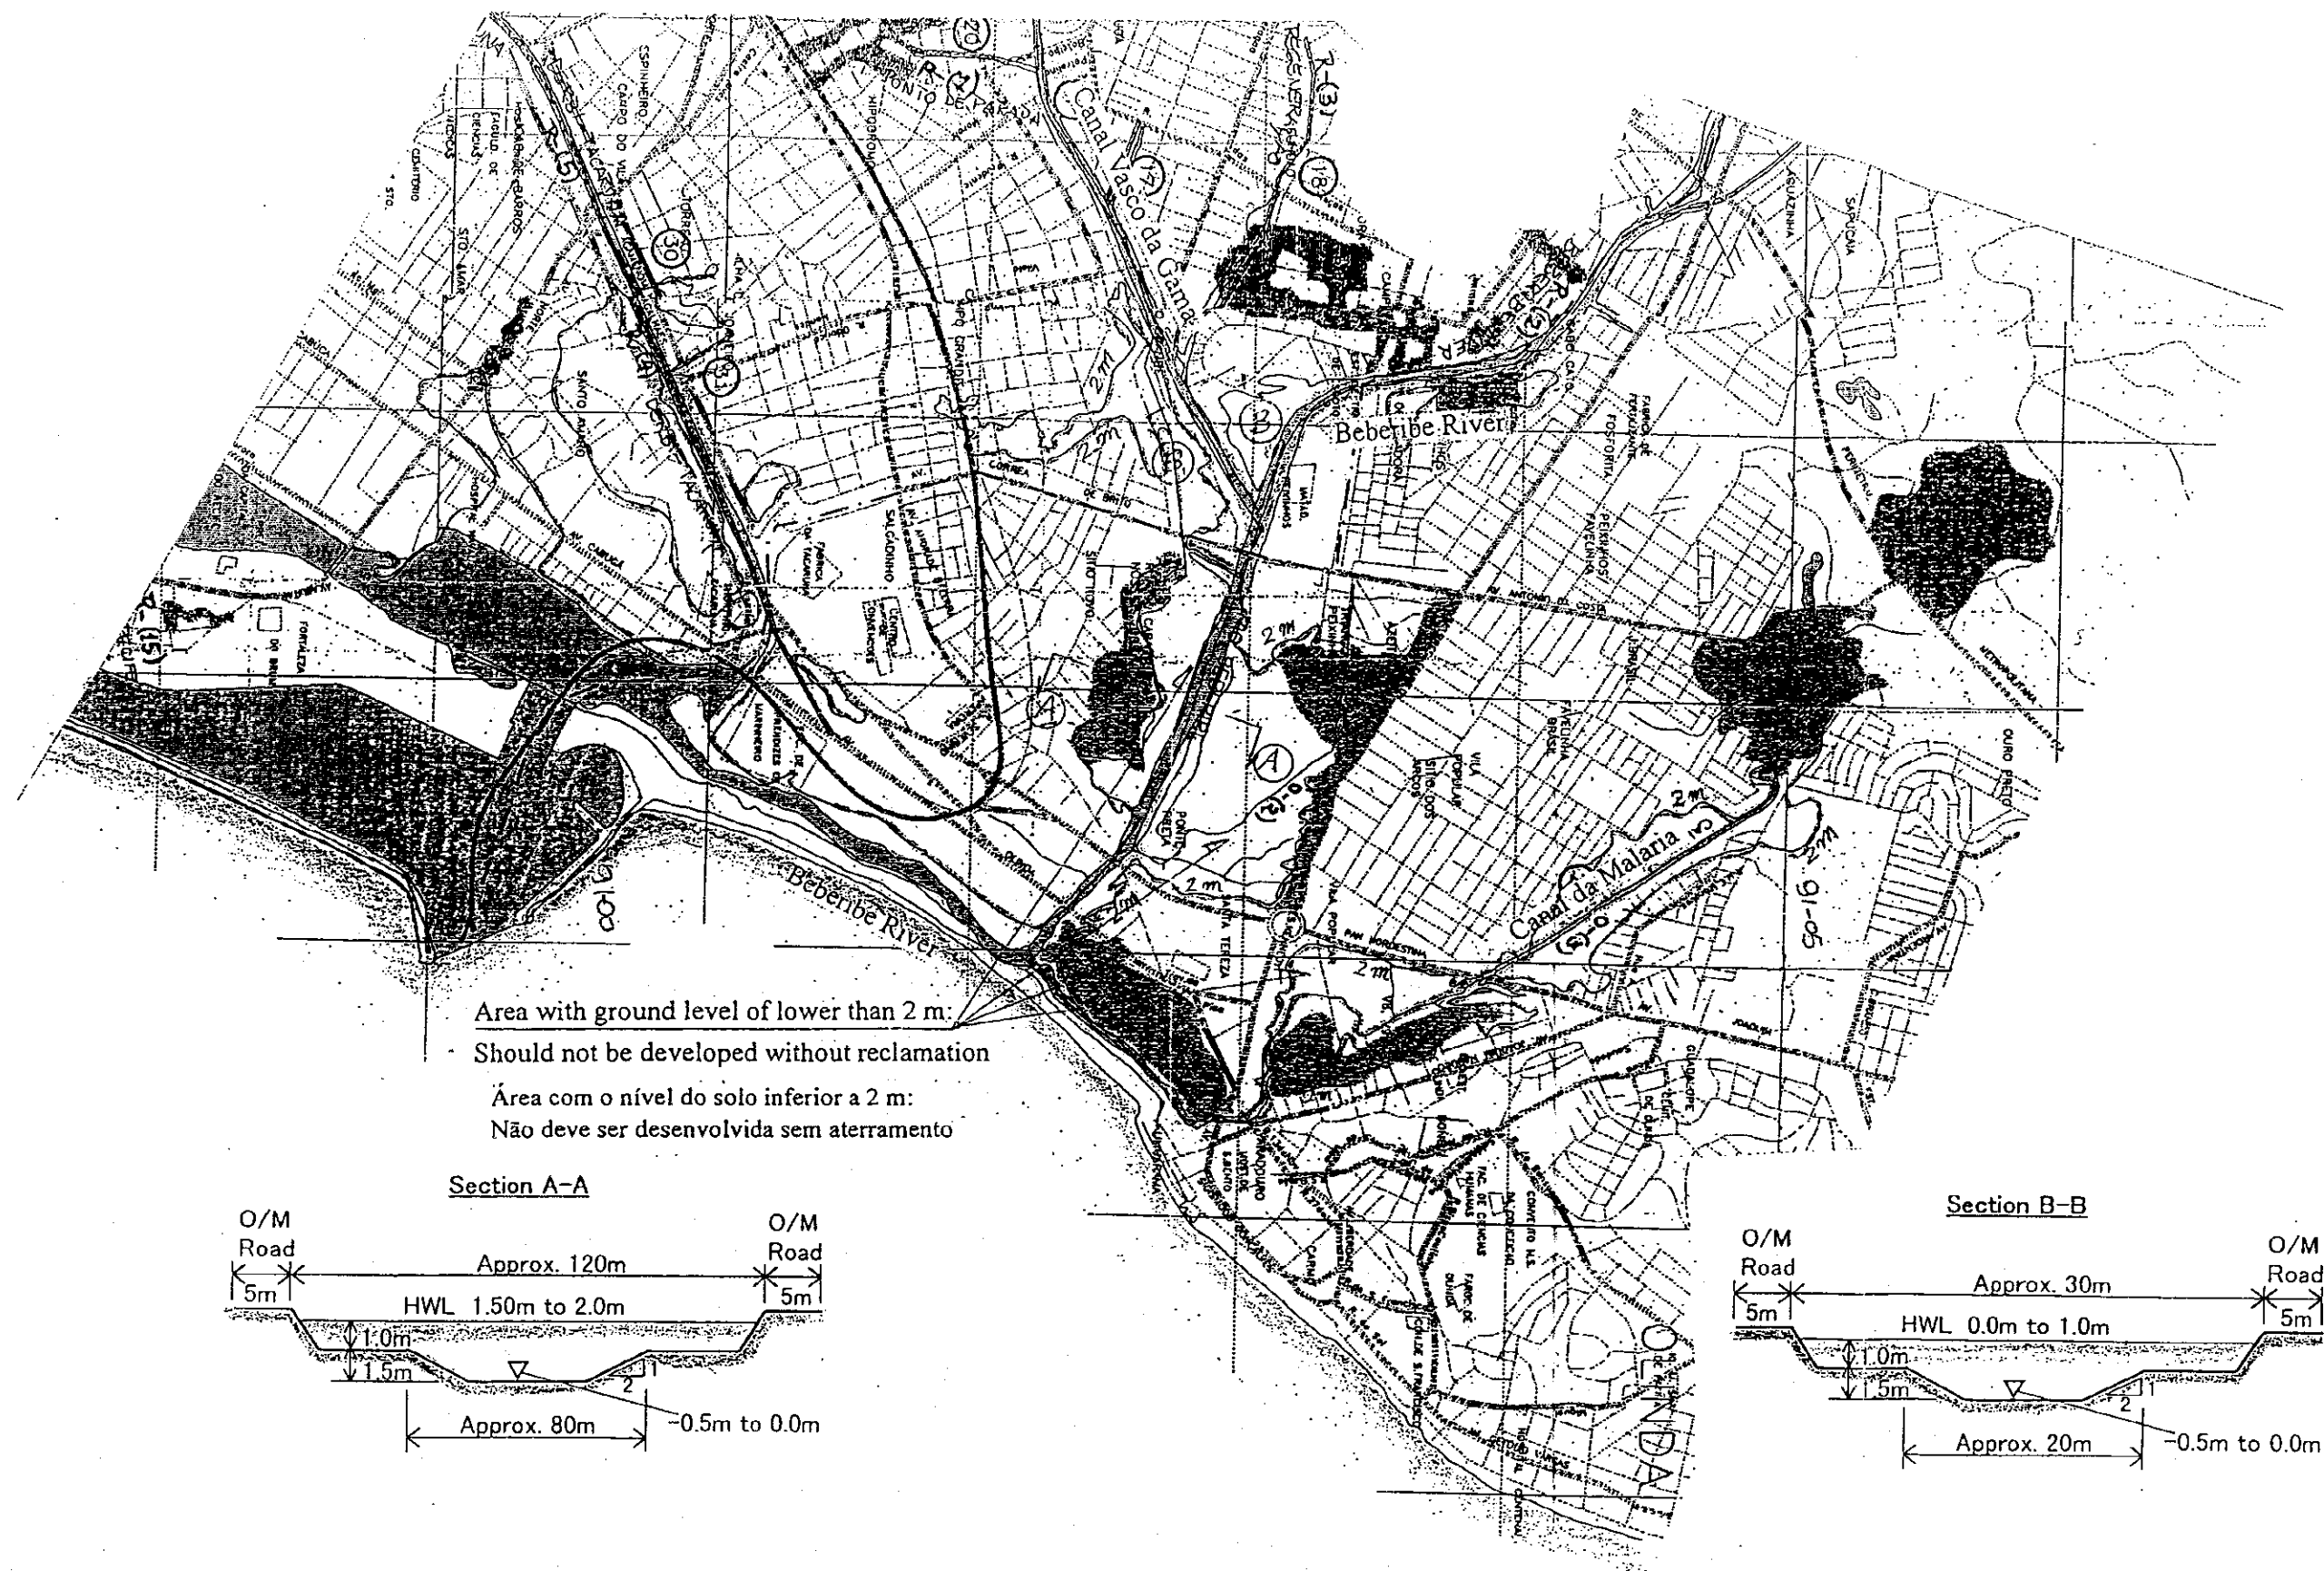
(1/2) Concept of Drainage Improvement Plan for Beberibe River System
